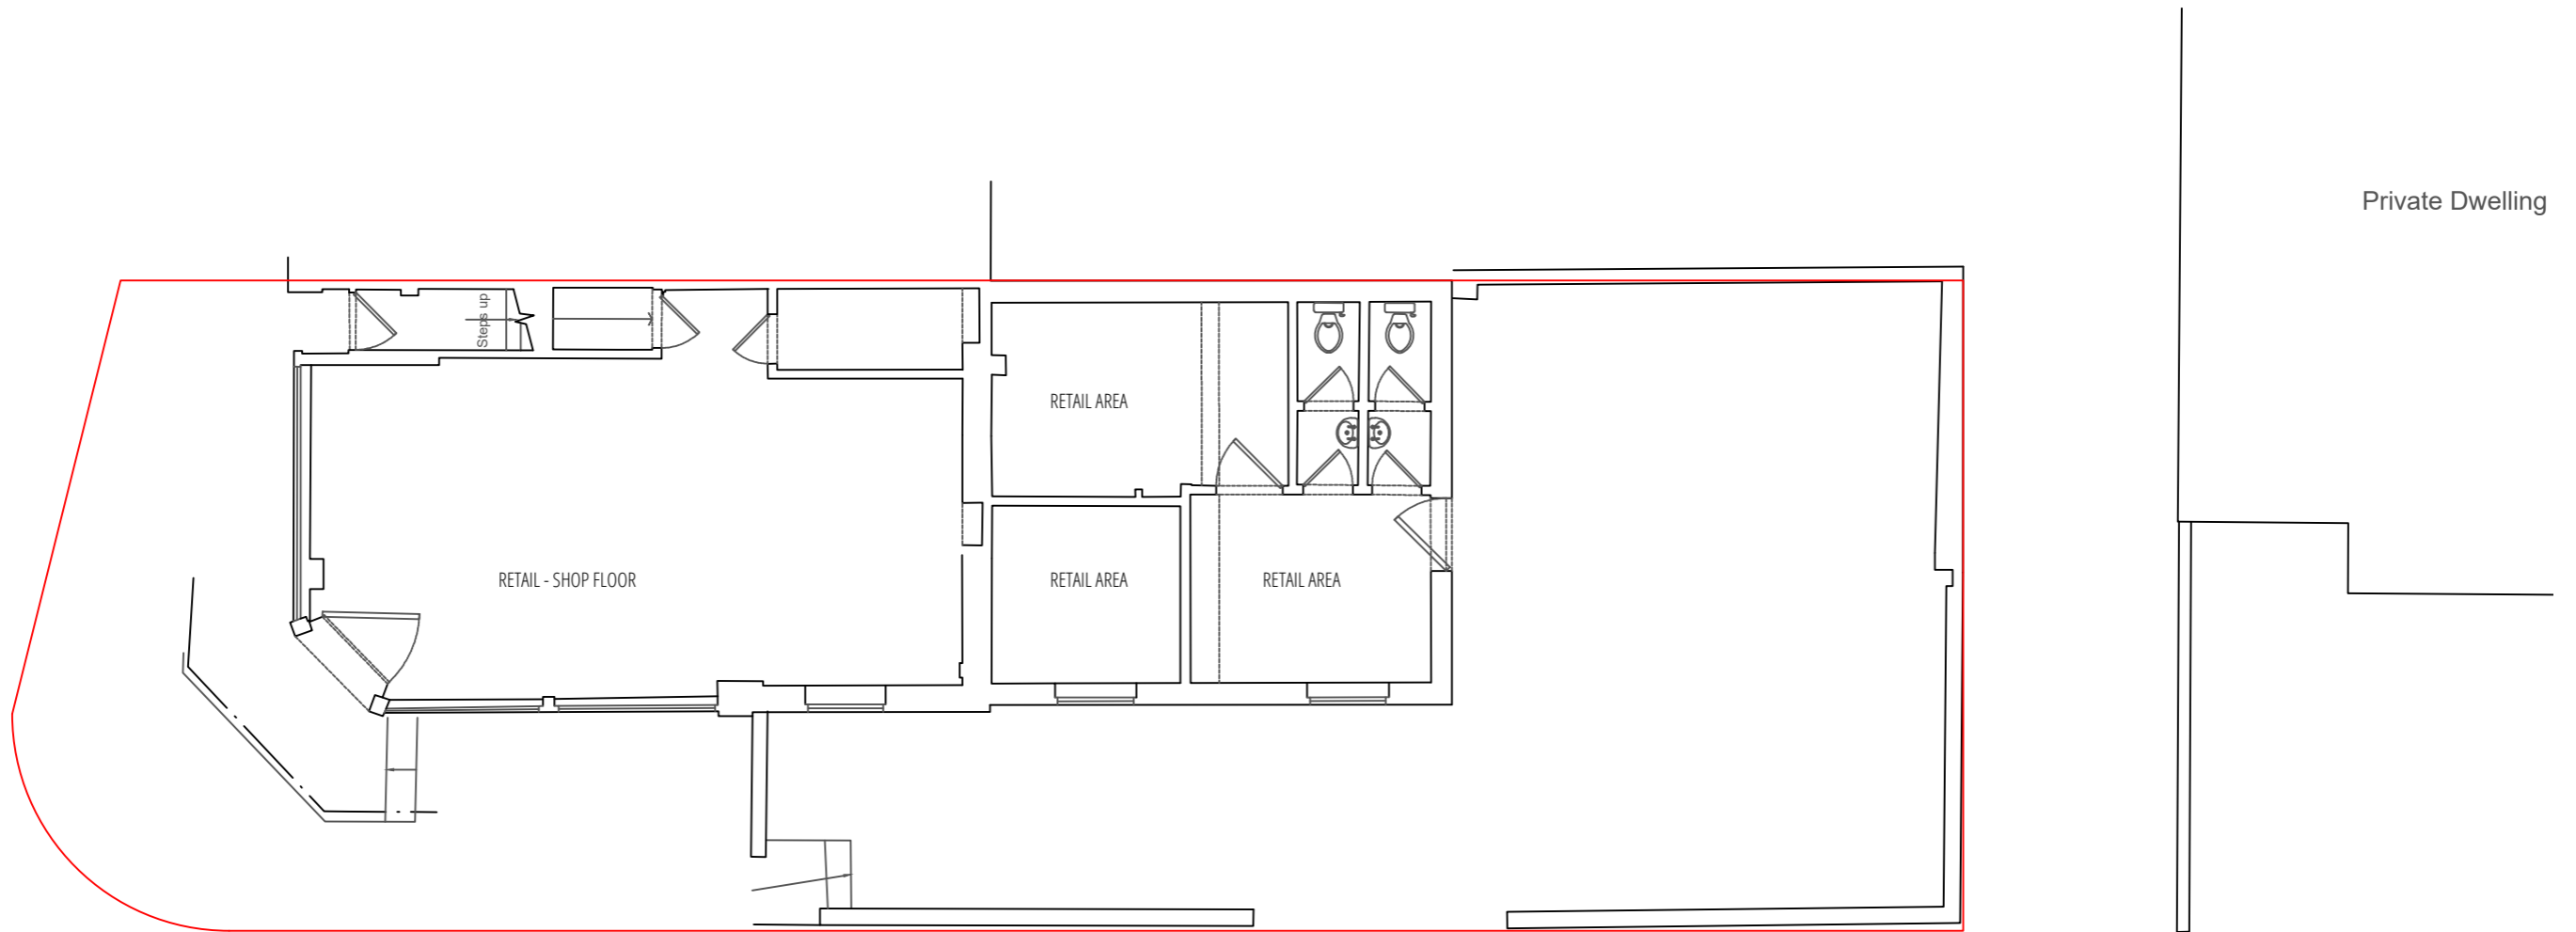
Existing Ground Floor Plan 1:100 @ A3
